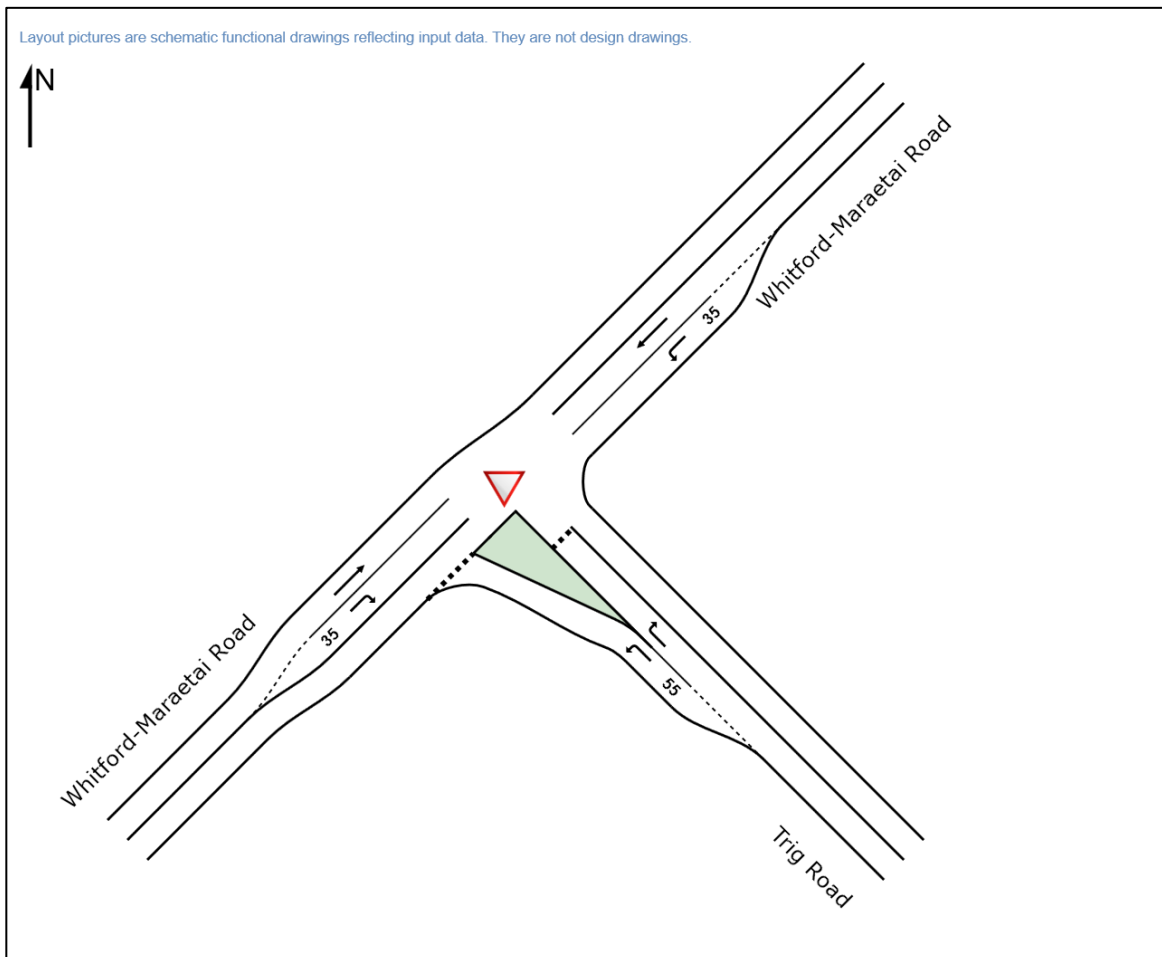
Existing Whitford-Maraetai/Trig Road Give-Way controlled intersection
